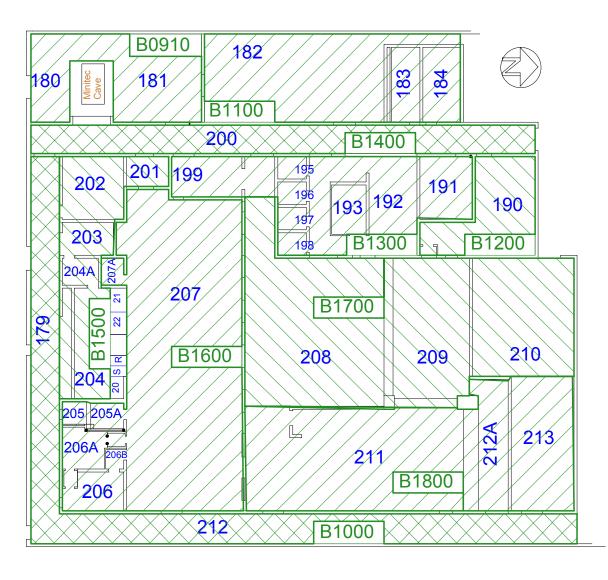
BMS B-124 New Section First Floor Class 2 Areas
